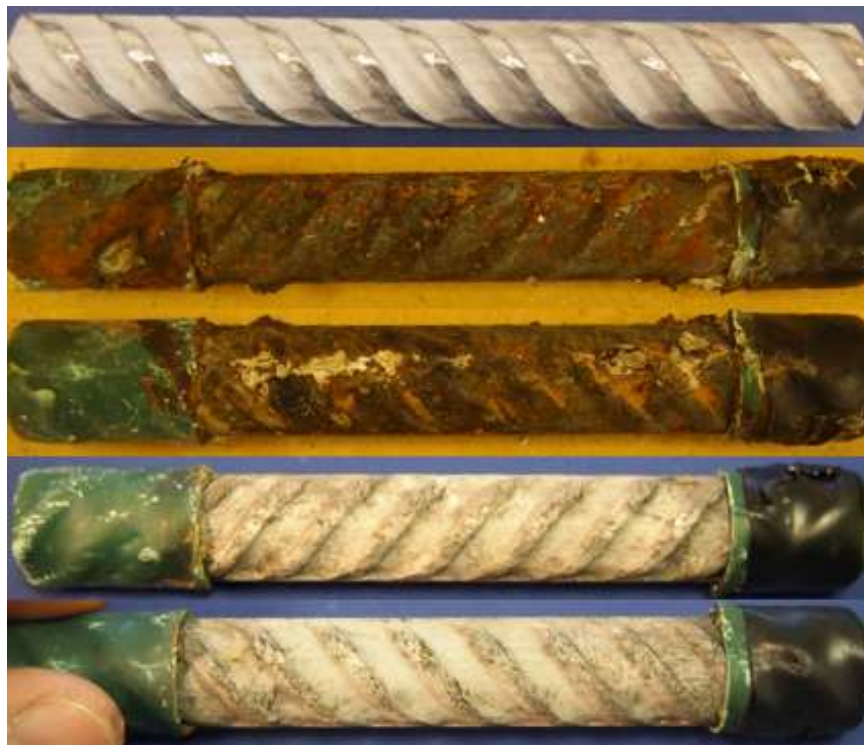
RST 7.5-400 Batch – XM-28 AR 8.3 Corrosion Products causing Cracking of Concrete Specimen
